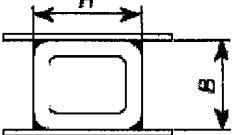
Misc. Connection: Truss Column C2 / Truss B7
